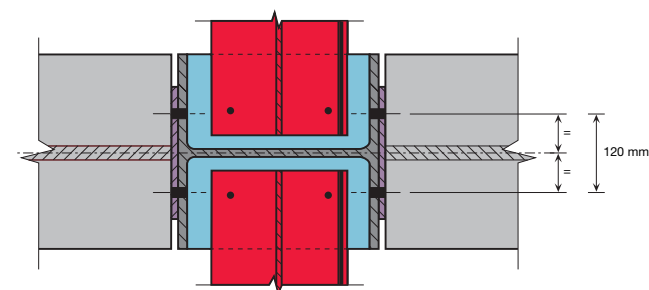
RHS tie with welded deck support plate and cut decking
